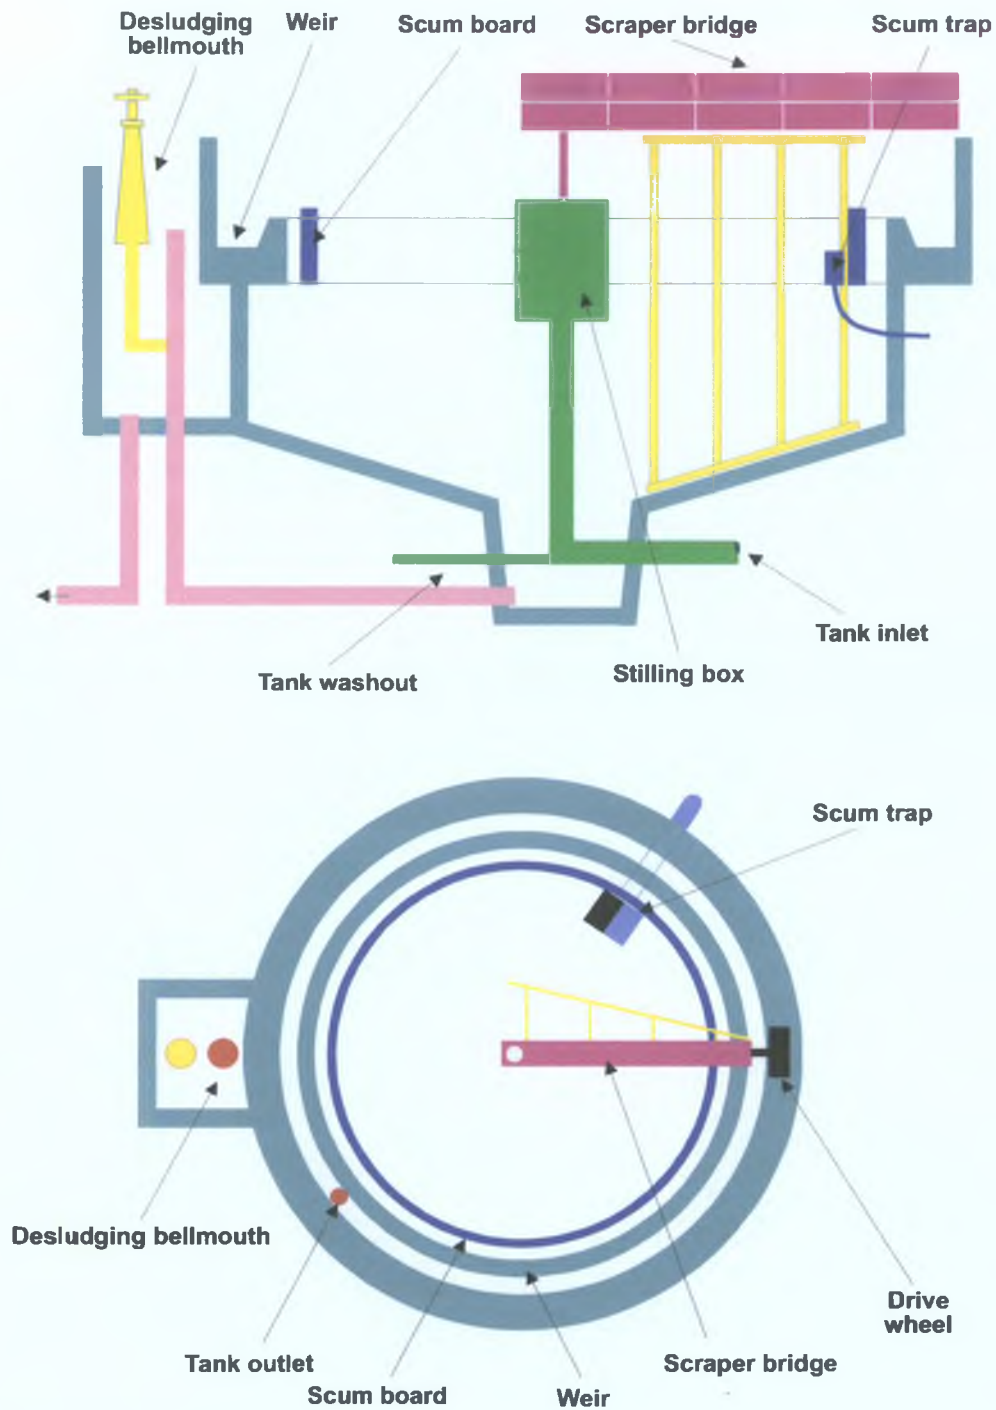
Typical Final Settlement Tank Layout (FAS, 1999). The top diagram is a section view, while the bottom shows the layout in plan view.
